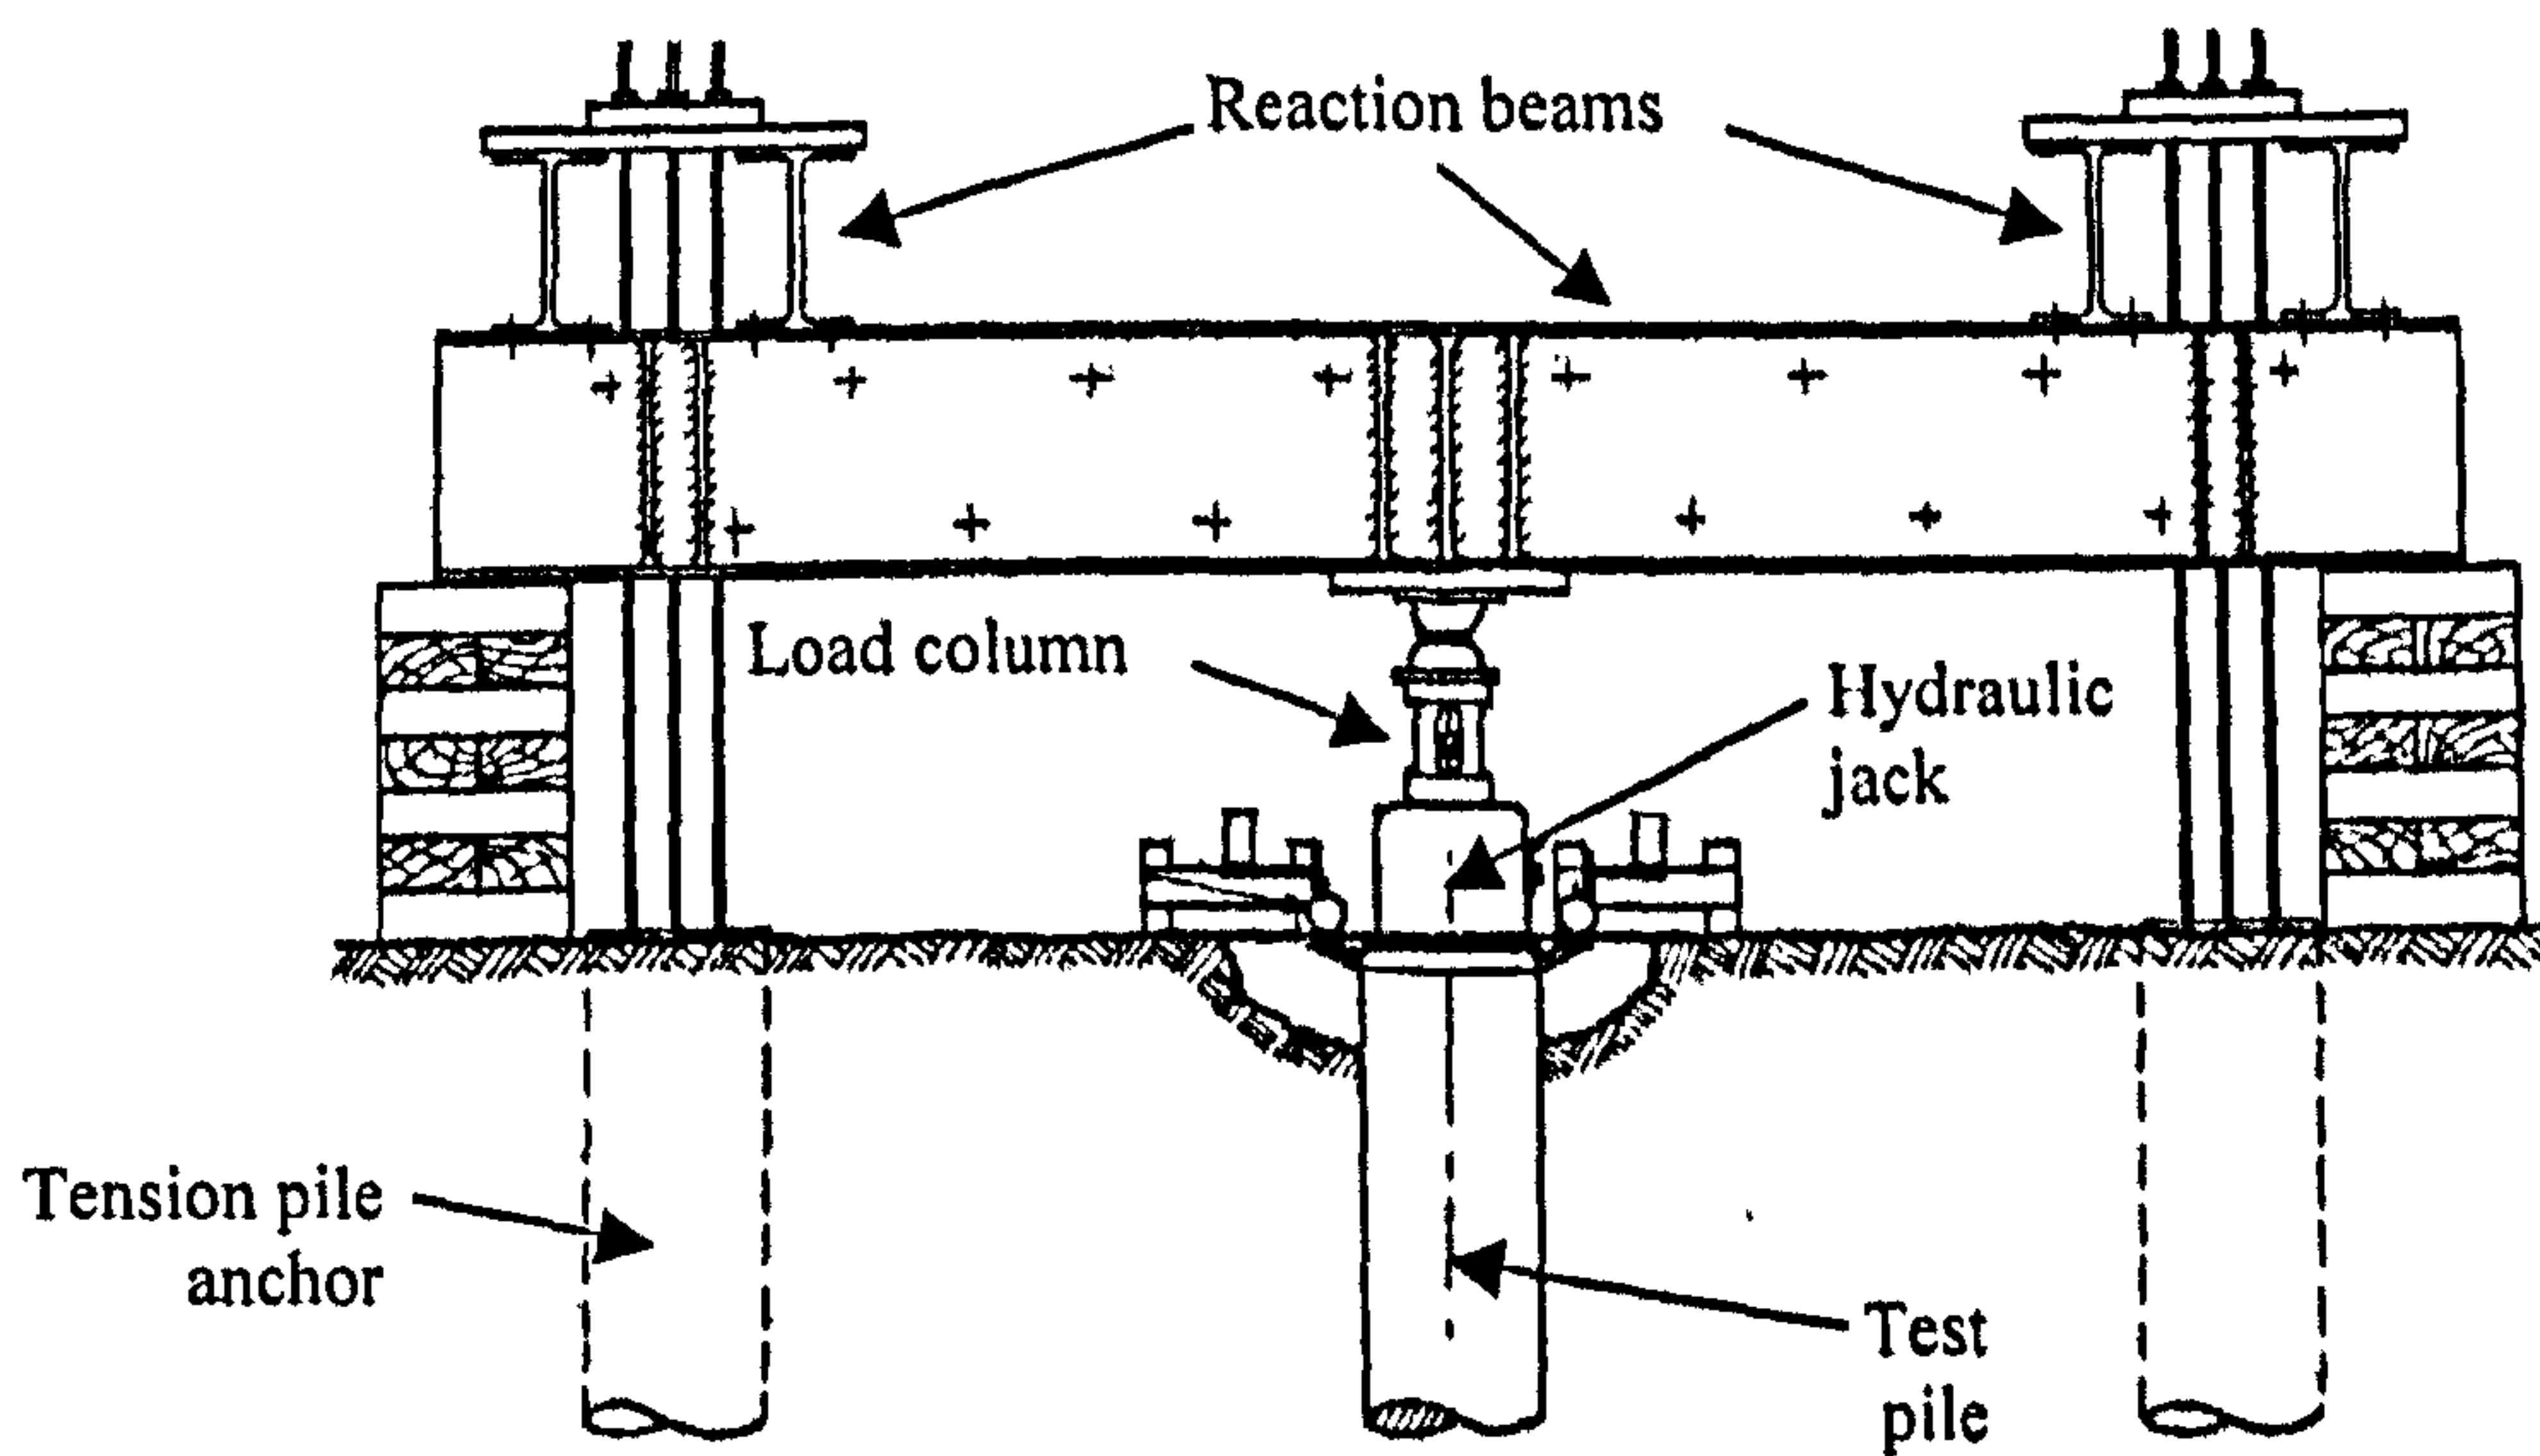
, Top down static pile testing arrangement utilising a tension pile reaction system (Weltman, 1980).
